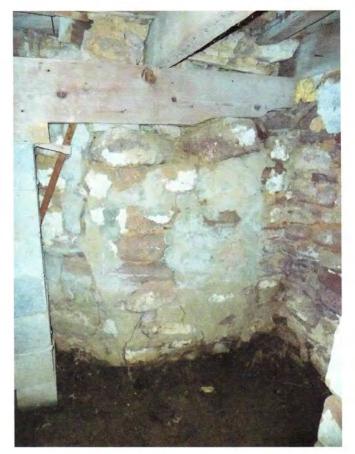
Bulge at the northwest corner (west wall) of the foundation. There is a door opening to the left of the bulged section of wall that has been filled with masonry.
